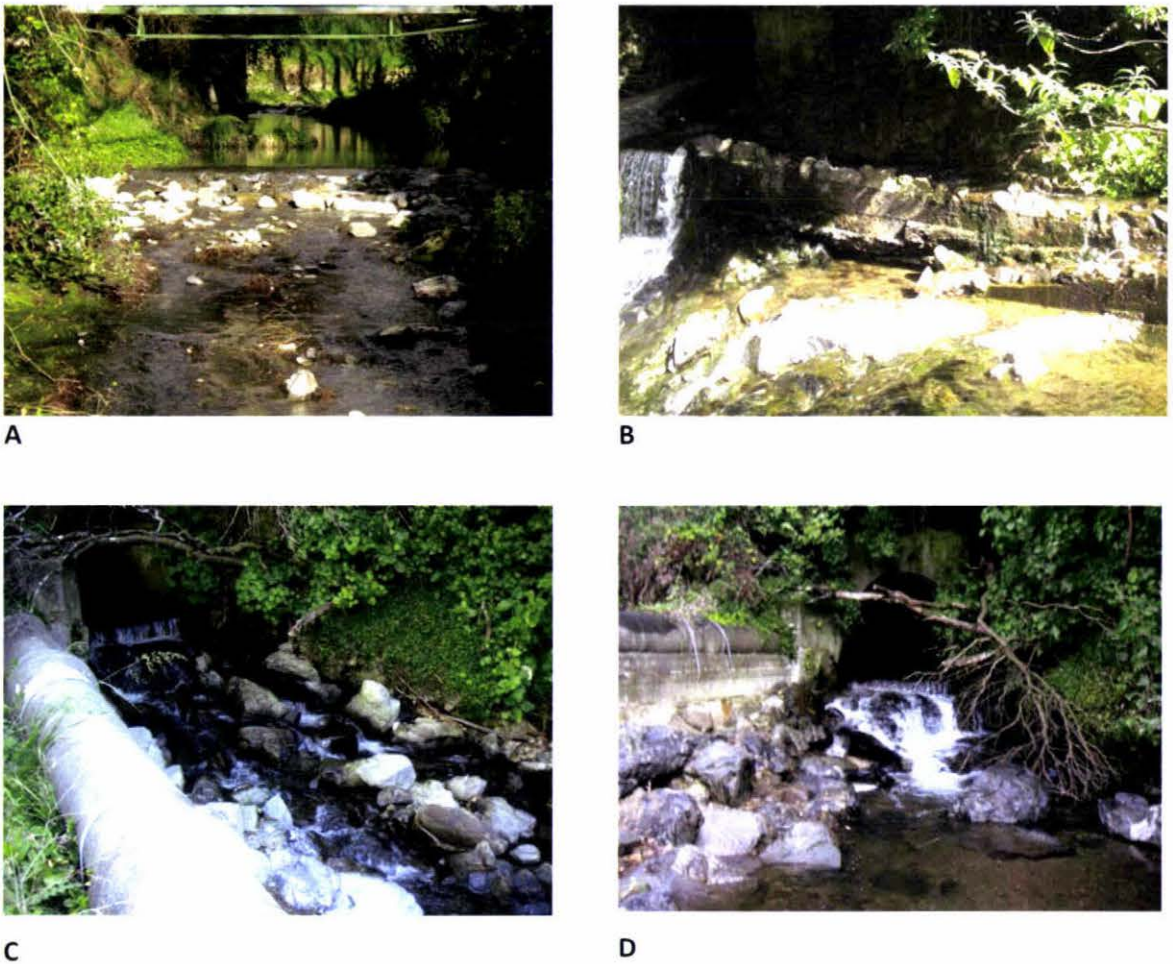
A. Hulls Creek fish pass. B. Fish pass installed on the tunnel structure on Kaiwharawhara Stream. C. Fish pass installed on the culvert on Kaiwharawhara Stream two months after it was installed. D. Fish pass installed on the culvert on Kaiwharawhara Stream 16 months after it was installed.
